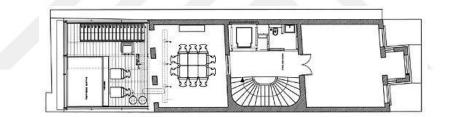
New first floors facing new ground floor of Changa Restaurant
